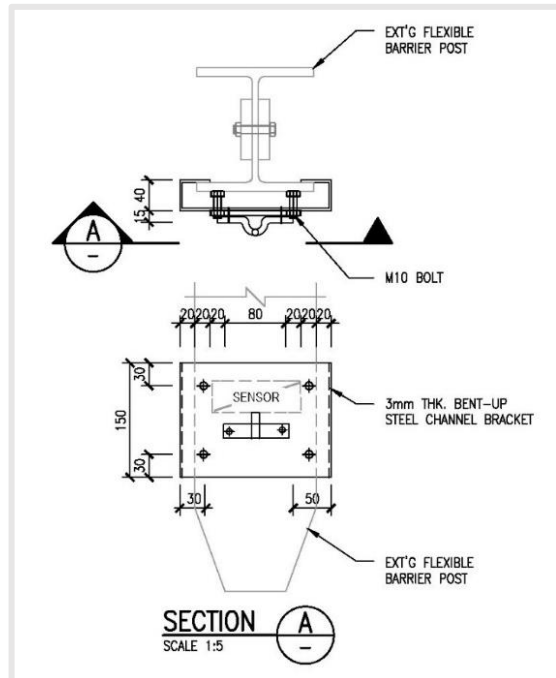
Schematic Details of Steel Clamp for Sensor Fixing Figure 8: Photo of Sensor Fixing to Steel Post
